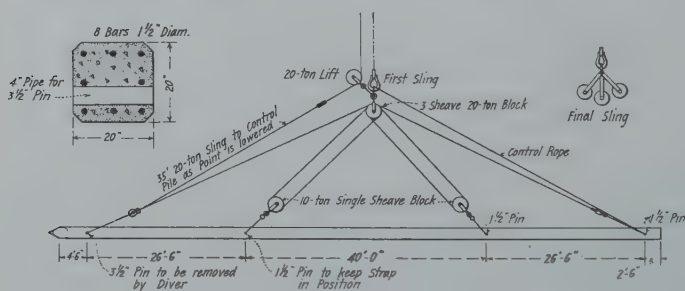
METHOD OF SLINGING 100-FOOT CONCRETE PILES USED AT AUCKLAND, NEW ZEALAND.
